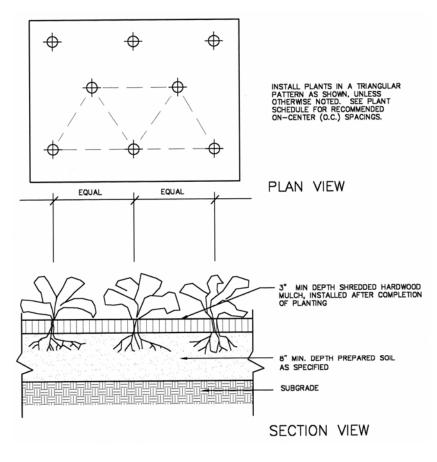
Ground Cover Planting. Source: Martha Lyon Landscape Architecture, LLC.
